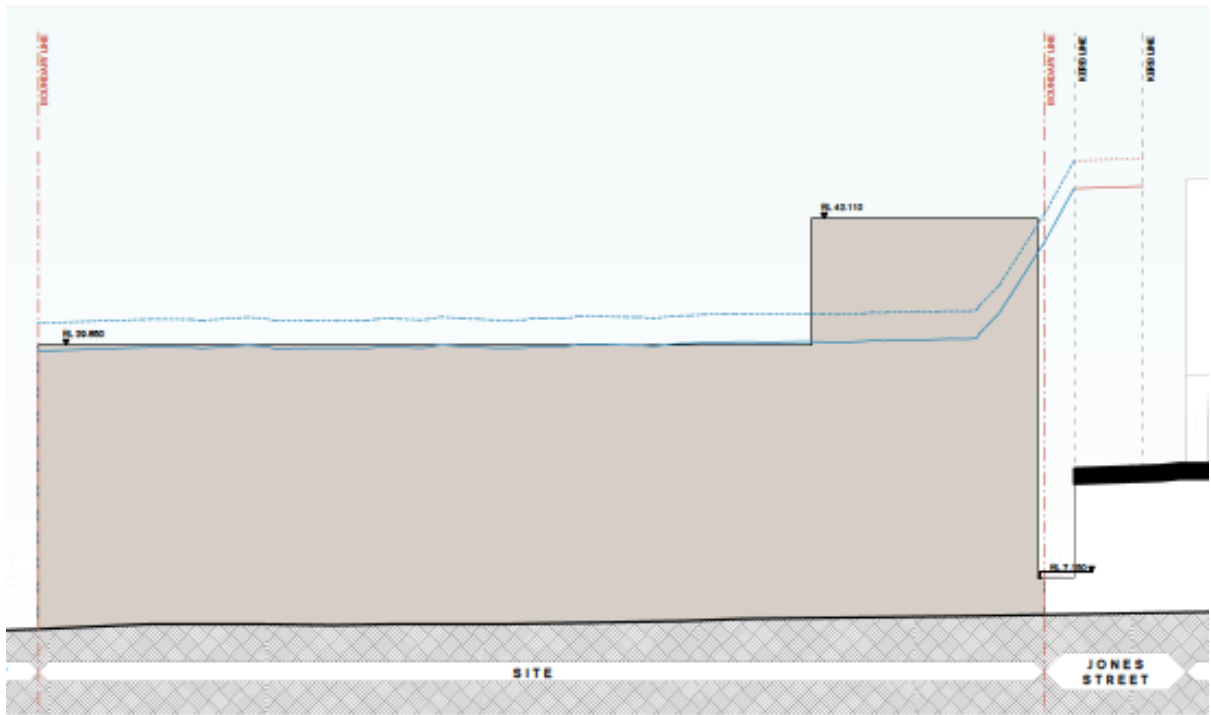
Location and Extent of competitive process – Elevation Fig Street
